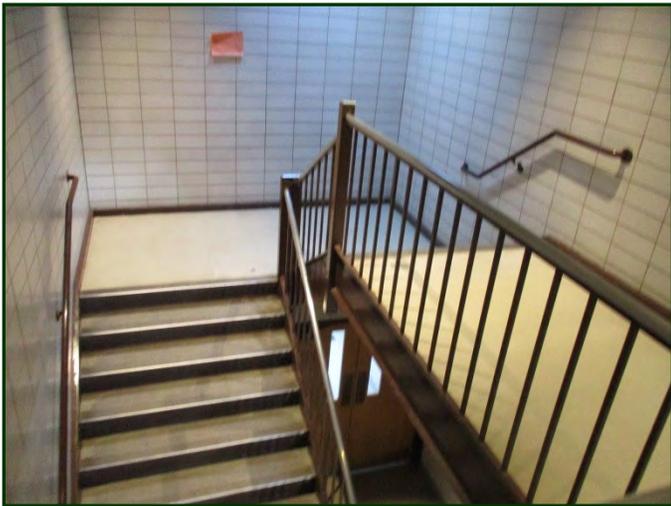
View of non-continuous (interrupted) handrail at interior handrail
